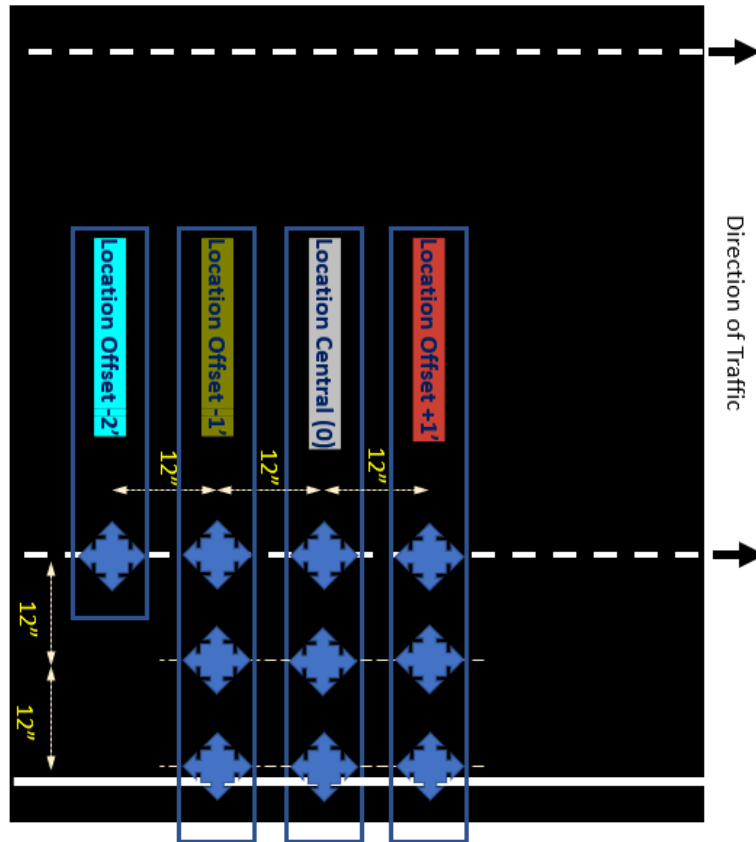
Overall plan view in sections 1b, 2, 3 & 4
